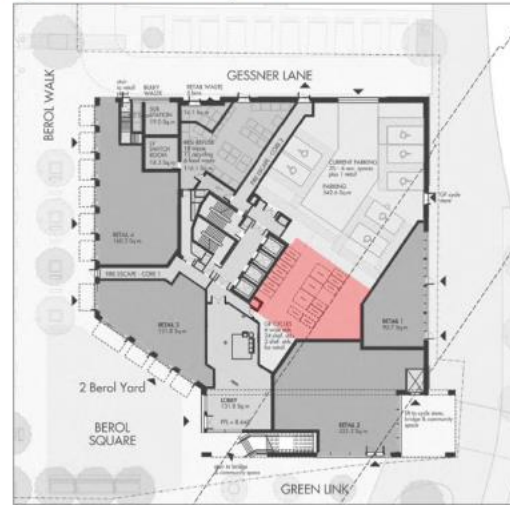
2 Berol Yard Ground Floor Cycle Facilities
